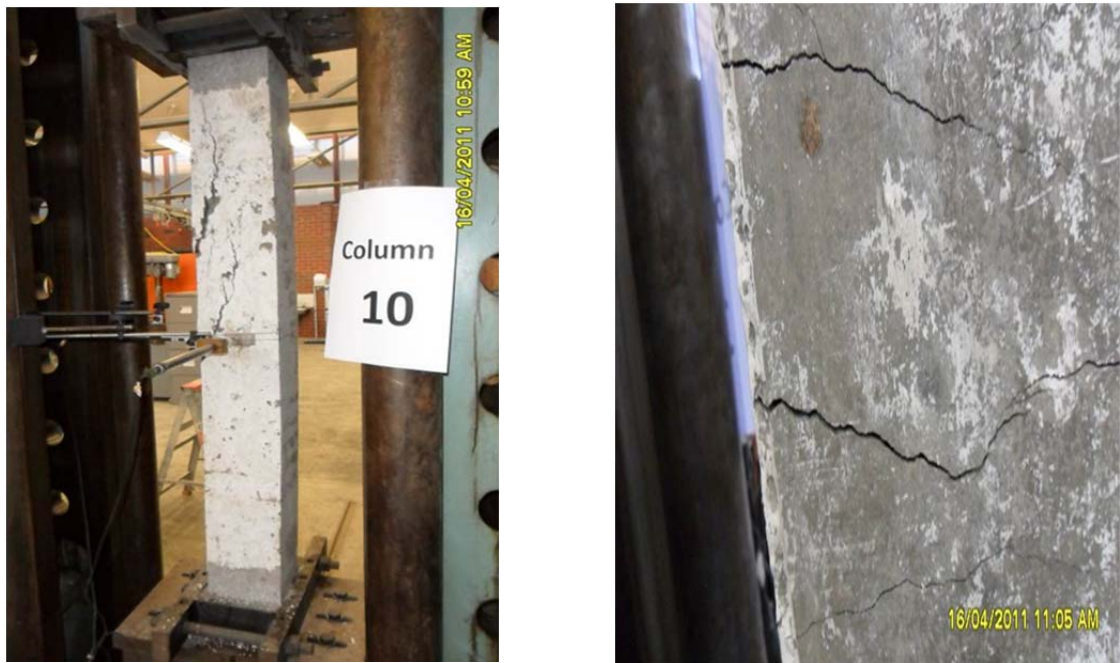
Failure mode of column GCIV-C1: (a) column after failure; (b) closer view of failure section
